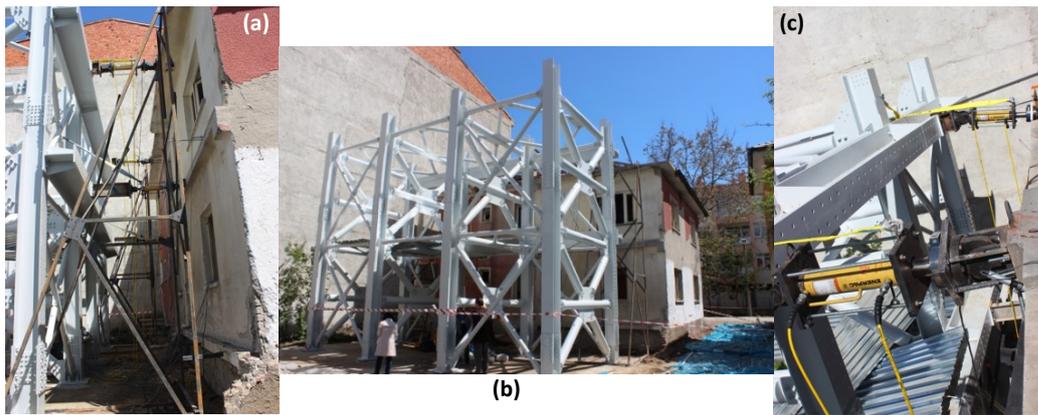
(a) Side view of LVDT's and hydraulic pistons, (b) photo of steel frame and (c) photos of hydraulic pistons at the second story
